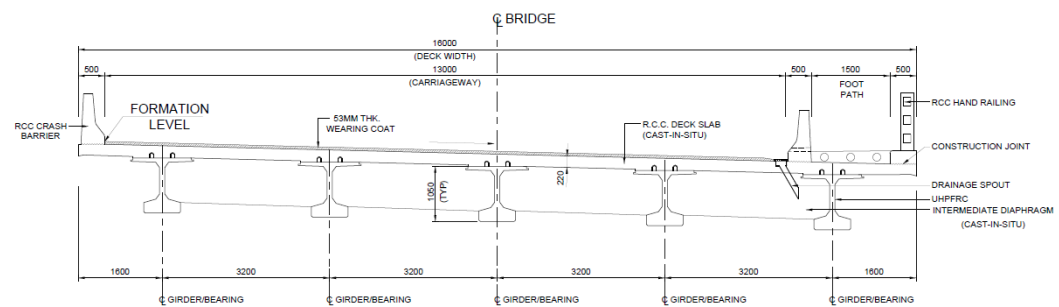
23 Cross section of 25m span UHPFRC post tensioned I girder at mid span
